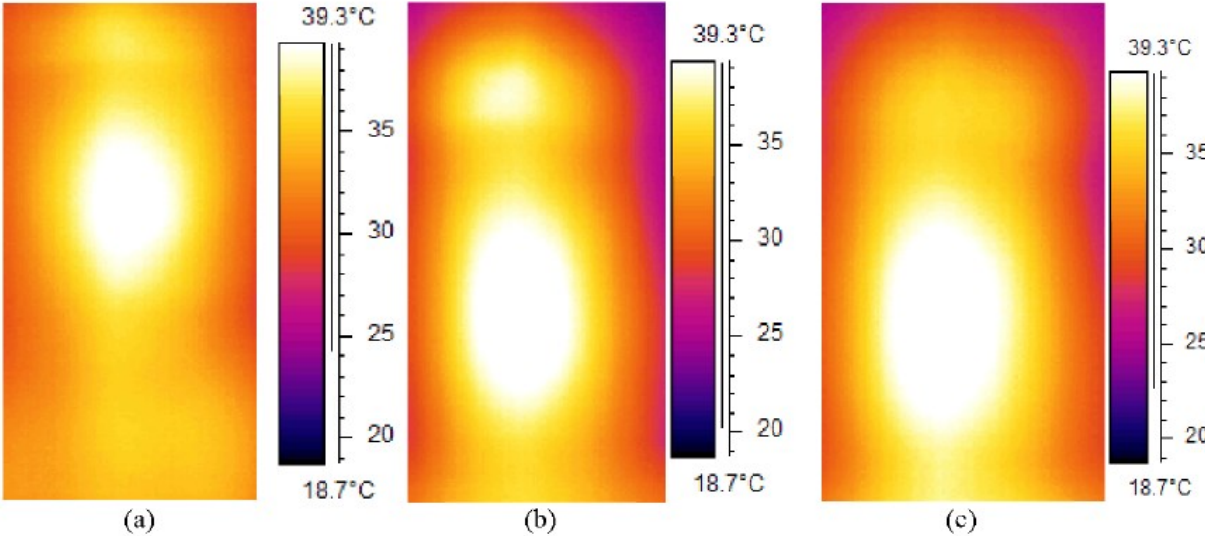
Water-filled debonds on CFRP wrapped cylinders (a) 1.4" x 1.4" specimen (b) 2" x 2" specimen (c) 3" x 3" specimen (Halabe et al. 2008).
